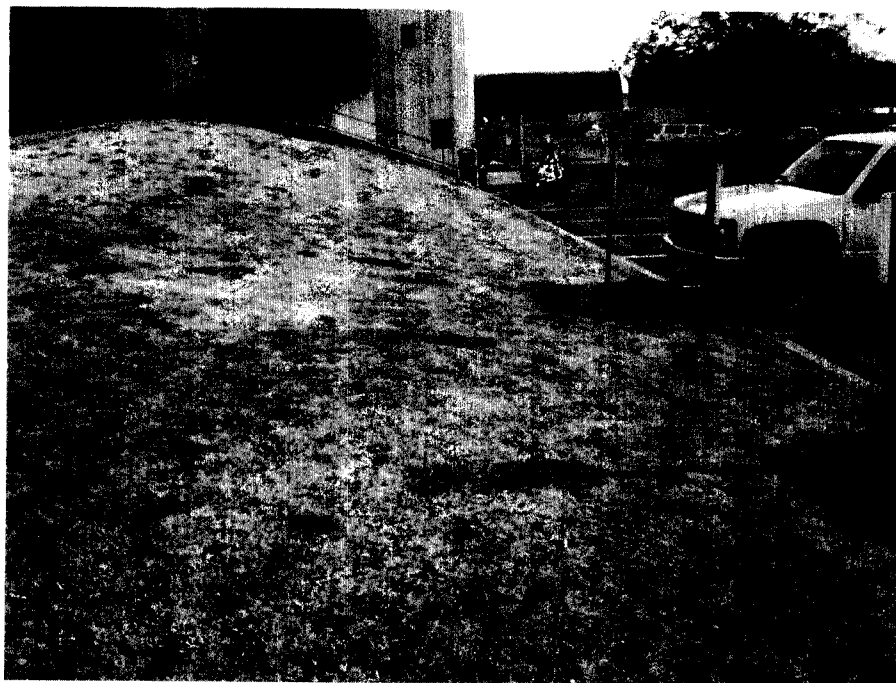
East side of Kellogg's parking lot looking south toward sample location RO-SB-7.
